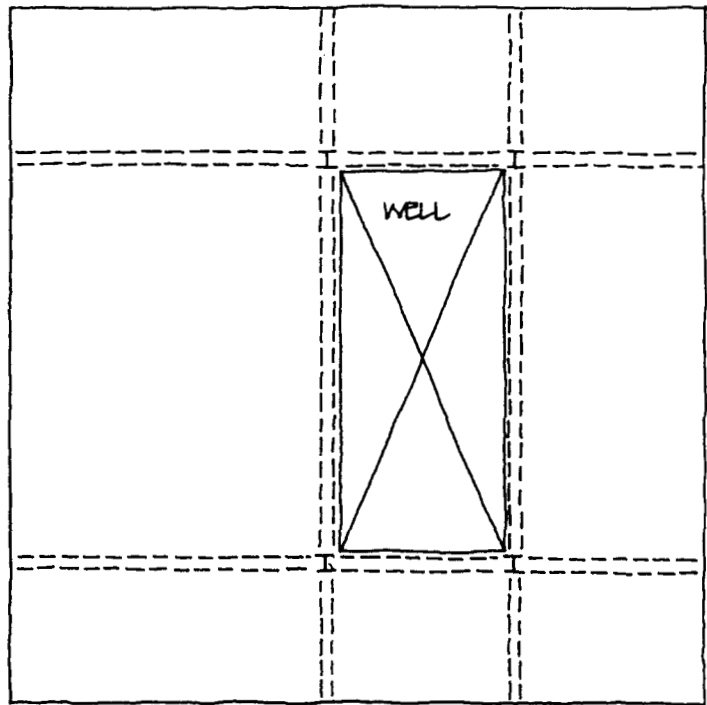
Horizontal framing schematic. Specially sized structural bay
